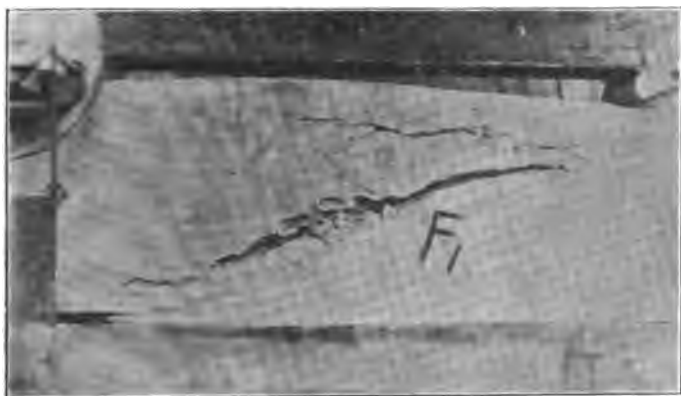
PLATE VII.—FAILURE CRACKS IN BEAMS F_1 , M_1 AND M_2 .
